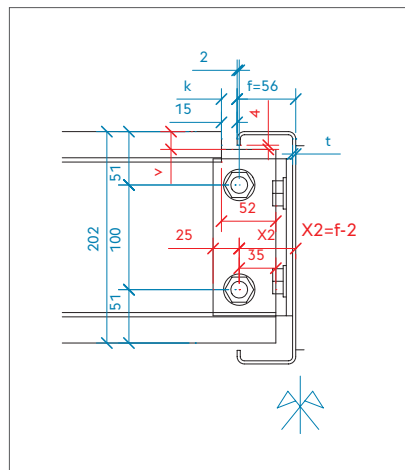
Example of a connection of a floor beam made of 202M15 to a girder made of 220M25
